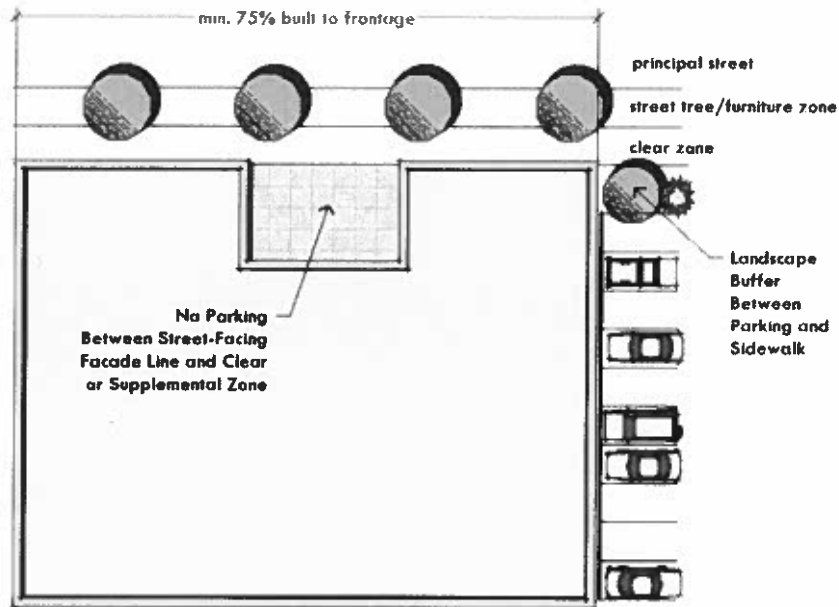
No parking is allowed between the street and the building façade and when parking is located to the side of a building, screening is required between the parking and the sidewalk (NBG Core Transit Corridor example).
